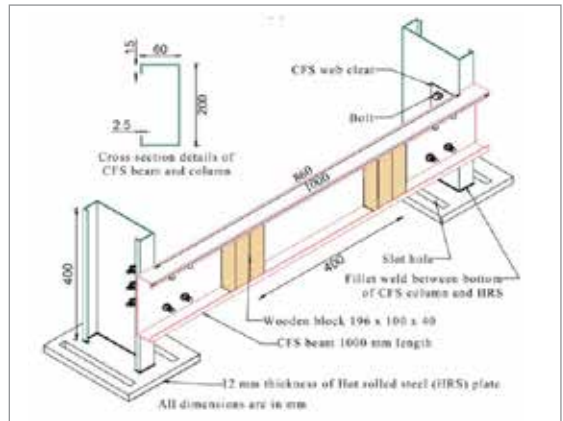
Experimental study of Beam-to-Column connection by bolted clip-angle
